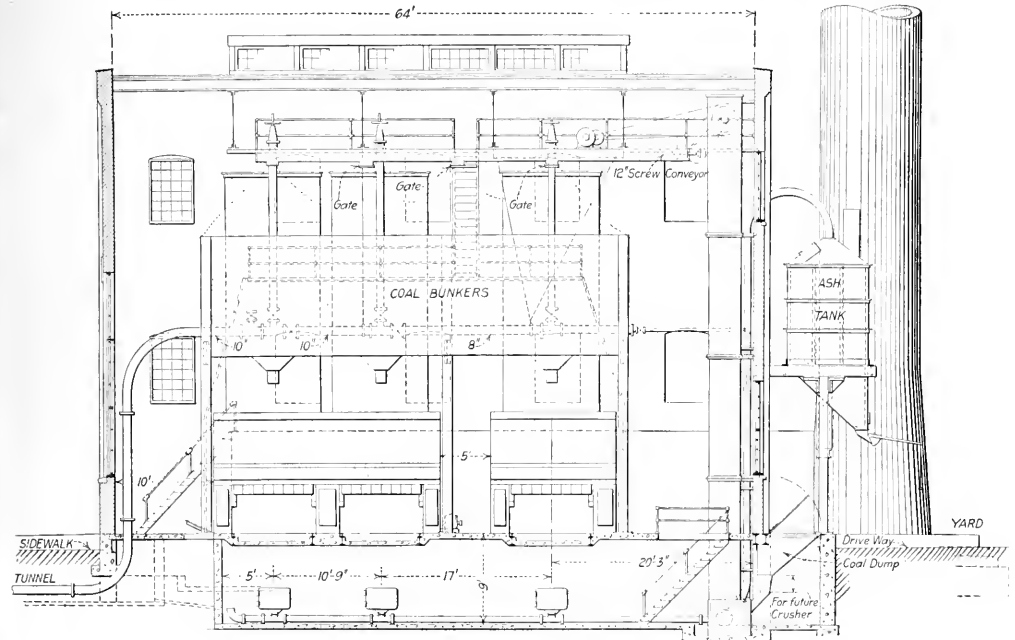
LONGITUDINAL SECTION SHOWING GENERAL ARRANGEMENT
